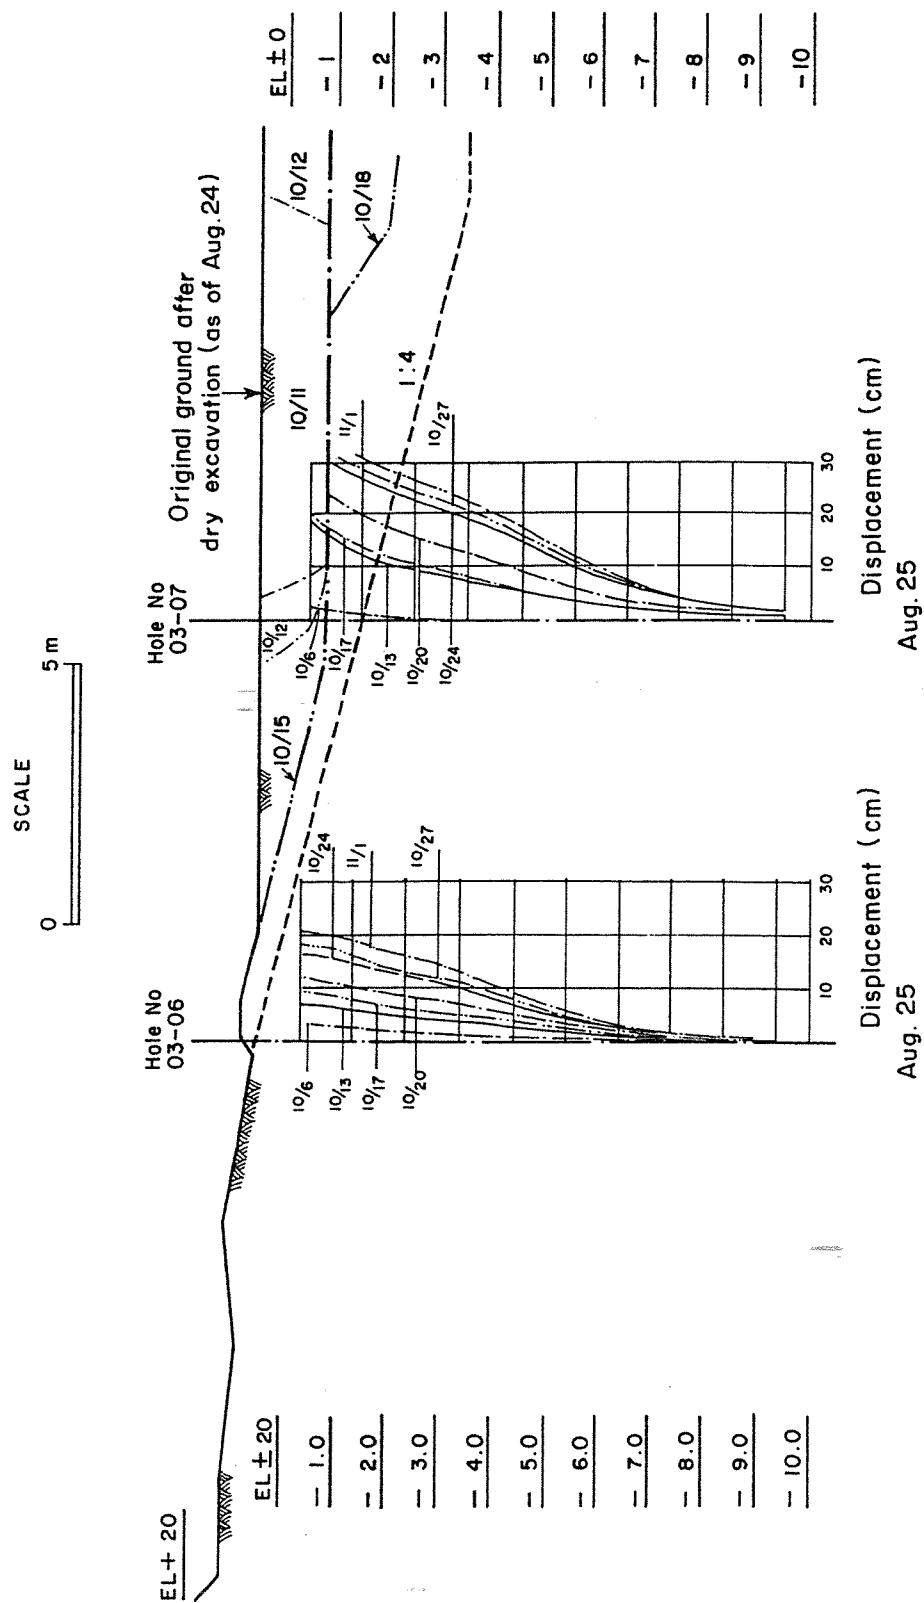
Observed Lateral Displacements at Bang Bo Site
